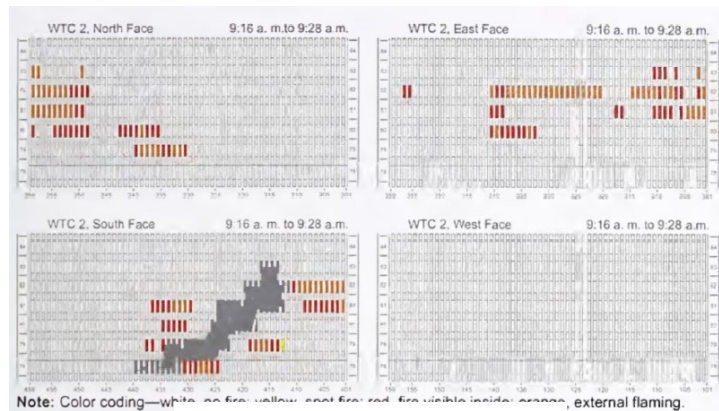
Exterior view of the fire development in the South Tower between 9:16a.m. and 9:28a.m. (NIST, 2005).
